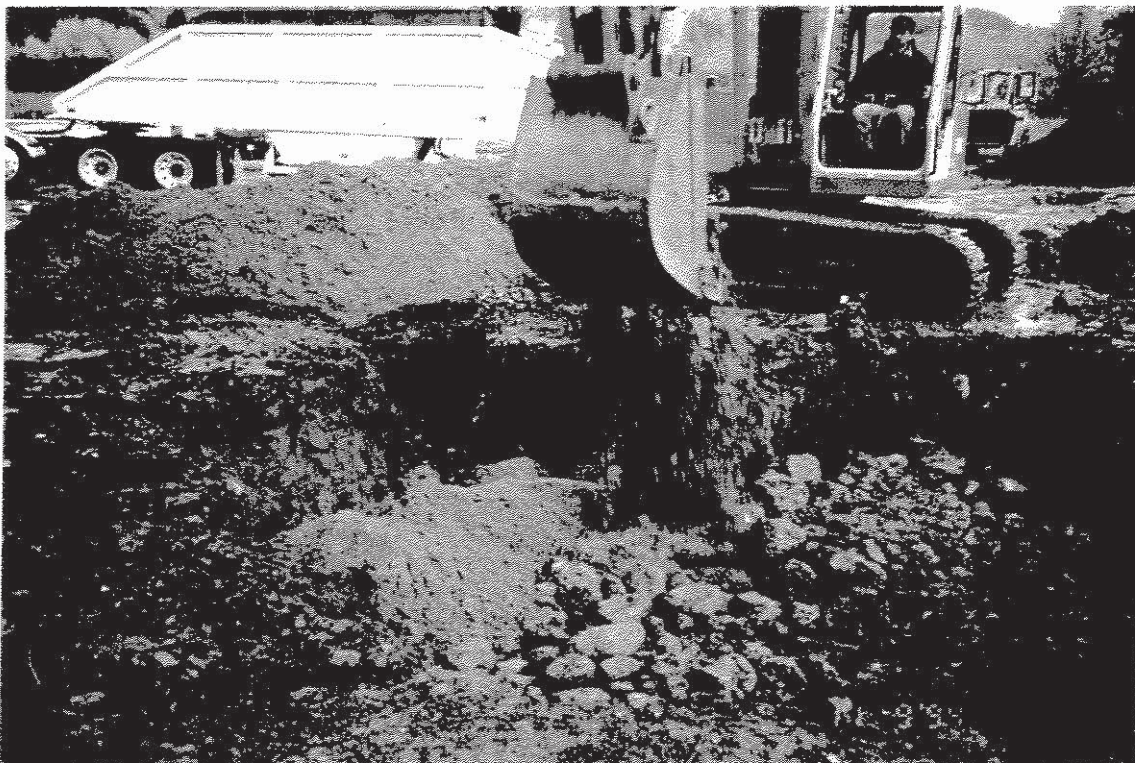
Shallow excavation. Cones mark MW-5 (foreground) and MW-1 (background). Photograph taken looking southeast.
